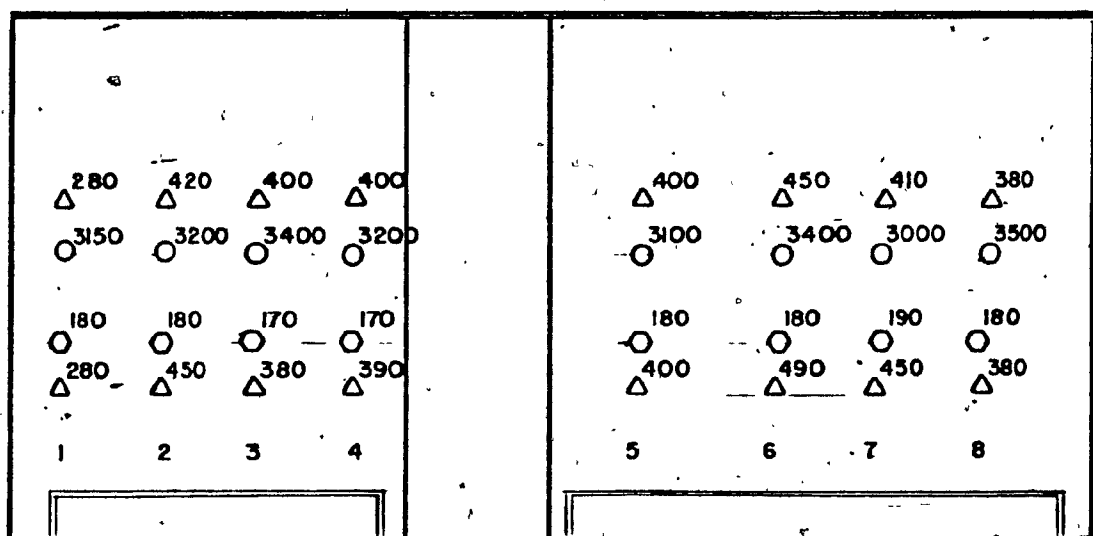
, Floor plan and reflected ceiling plan of gallery 218.
